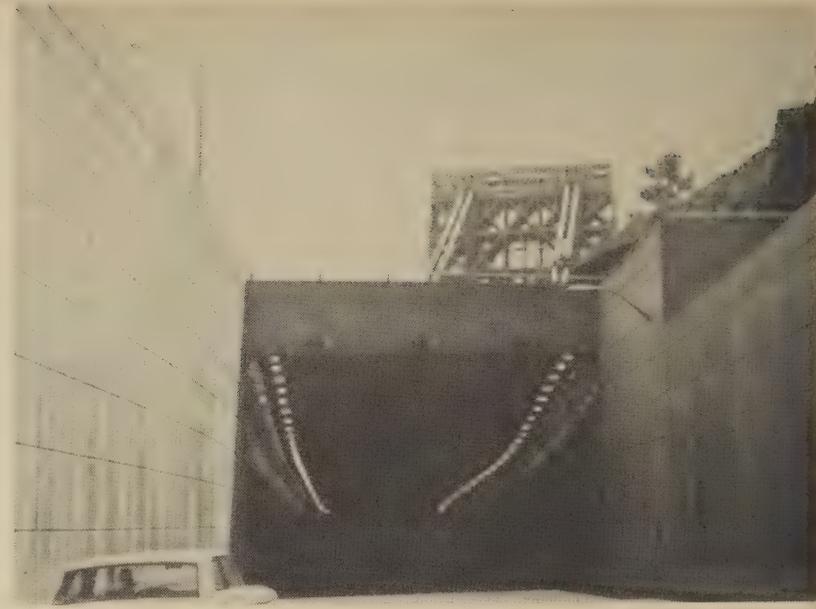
George Washington Bridge Lower-Level Tunnel—approach, daytime.
